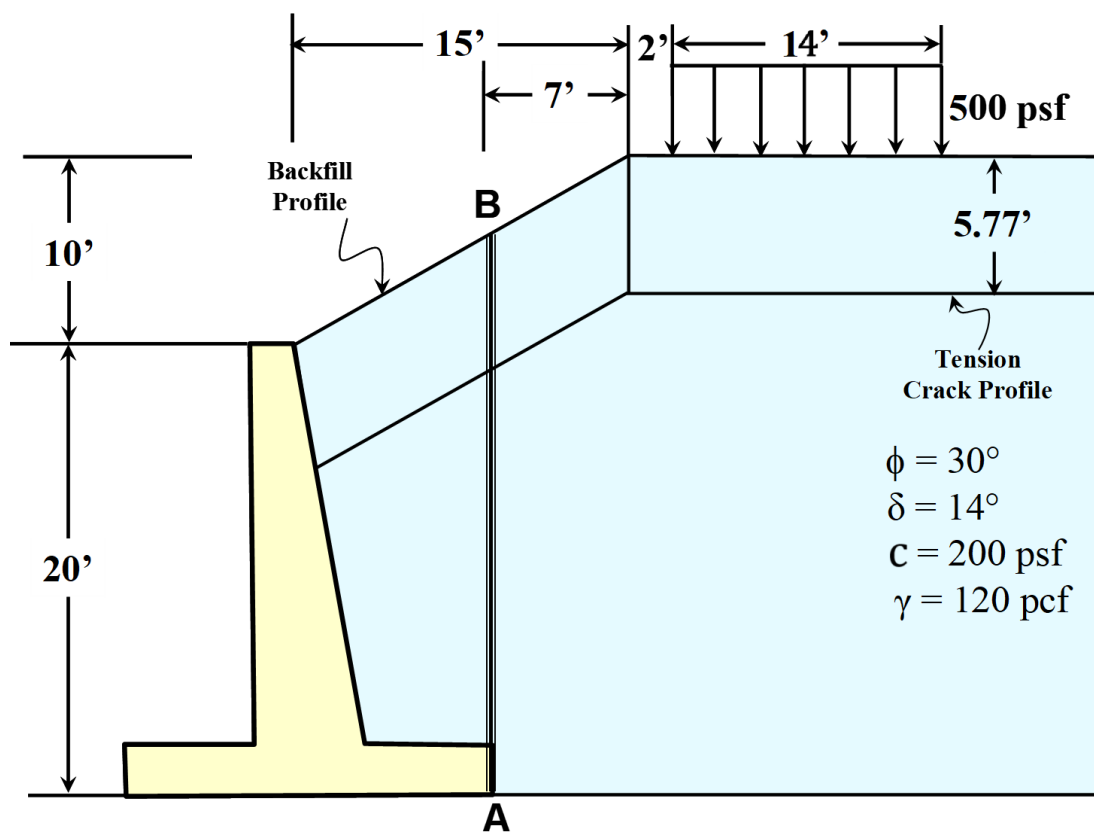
Retaining Wall by Culmann Method (AREMA Manual page 8-5-20)
